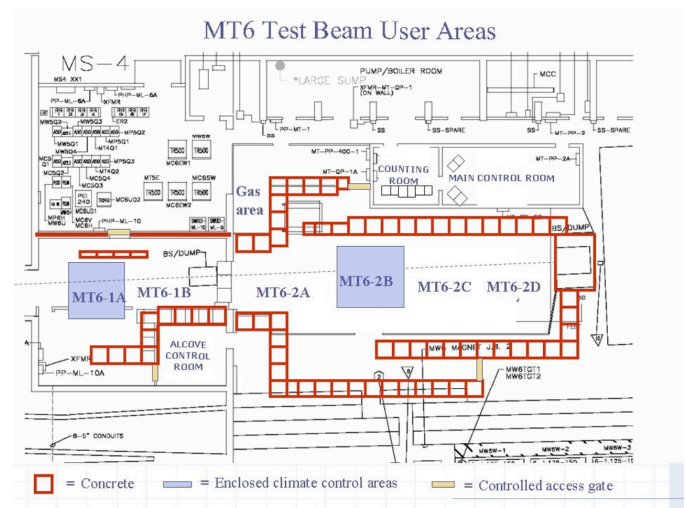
A plan view of Fermilab's Meson Test Beam Facility.
